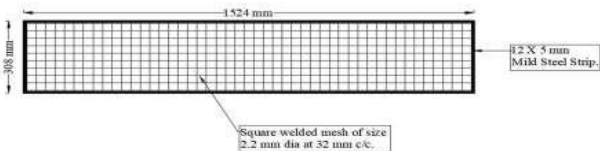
Flange Reinforcement in C-Channel & Rectangle Slabs
